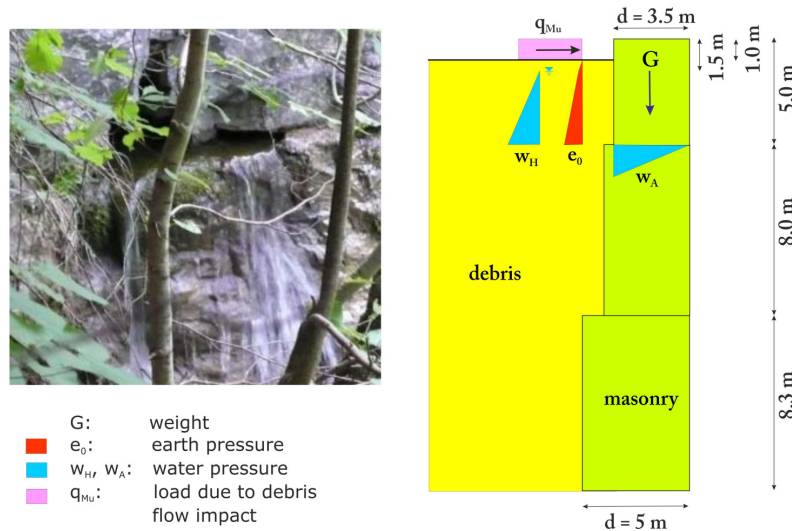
water outlet and cross section of check dam I, position of the water outlet at 5 m below the capstone
